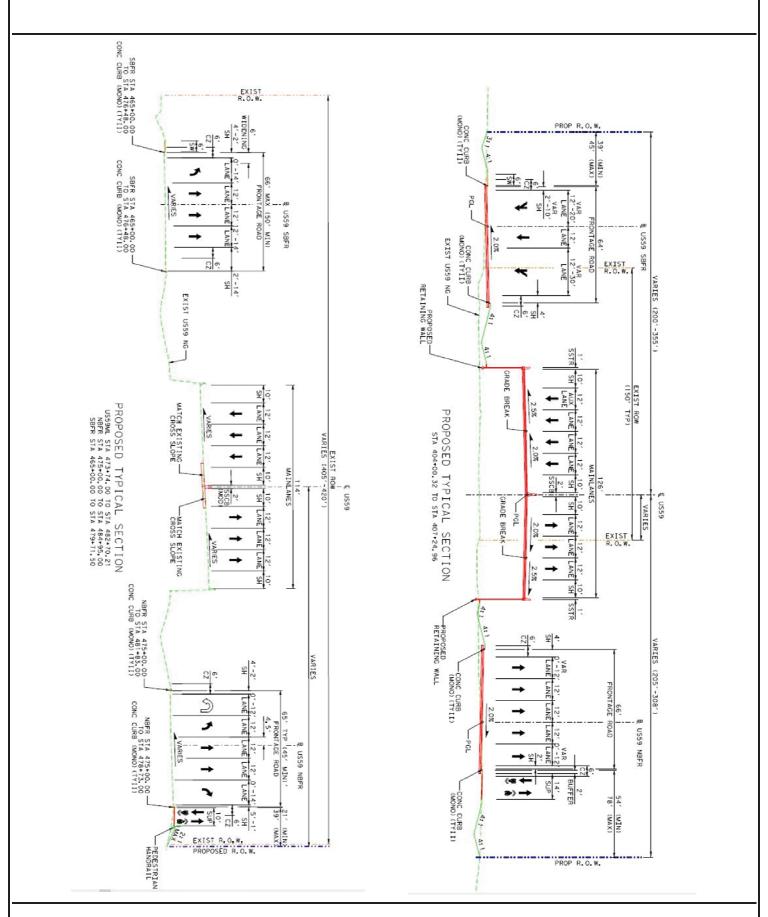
Exhibit D: Existing and Proposed Typical Section US 59 Loop — CSJ # 0086-14-058, etc.
